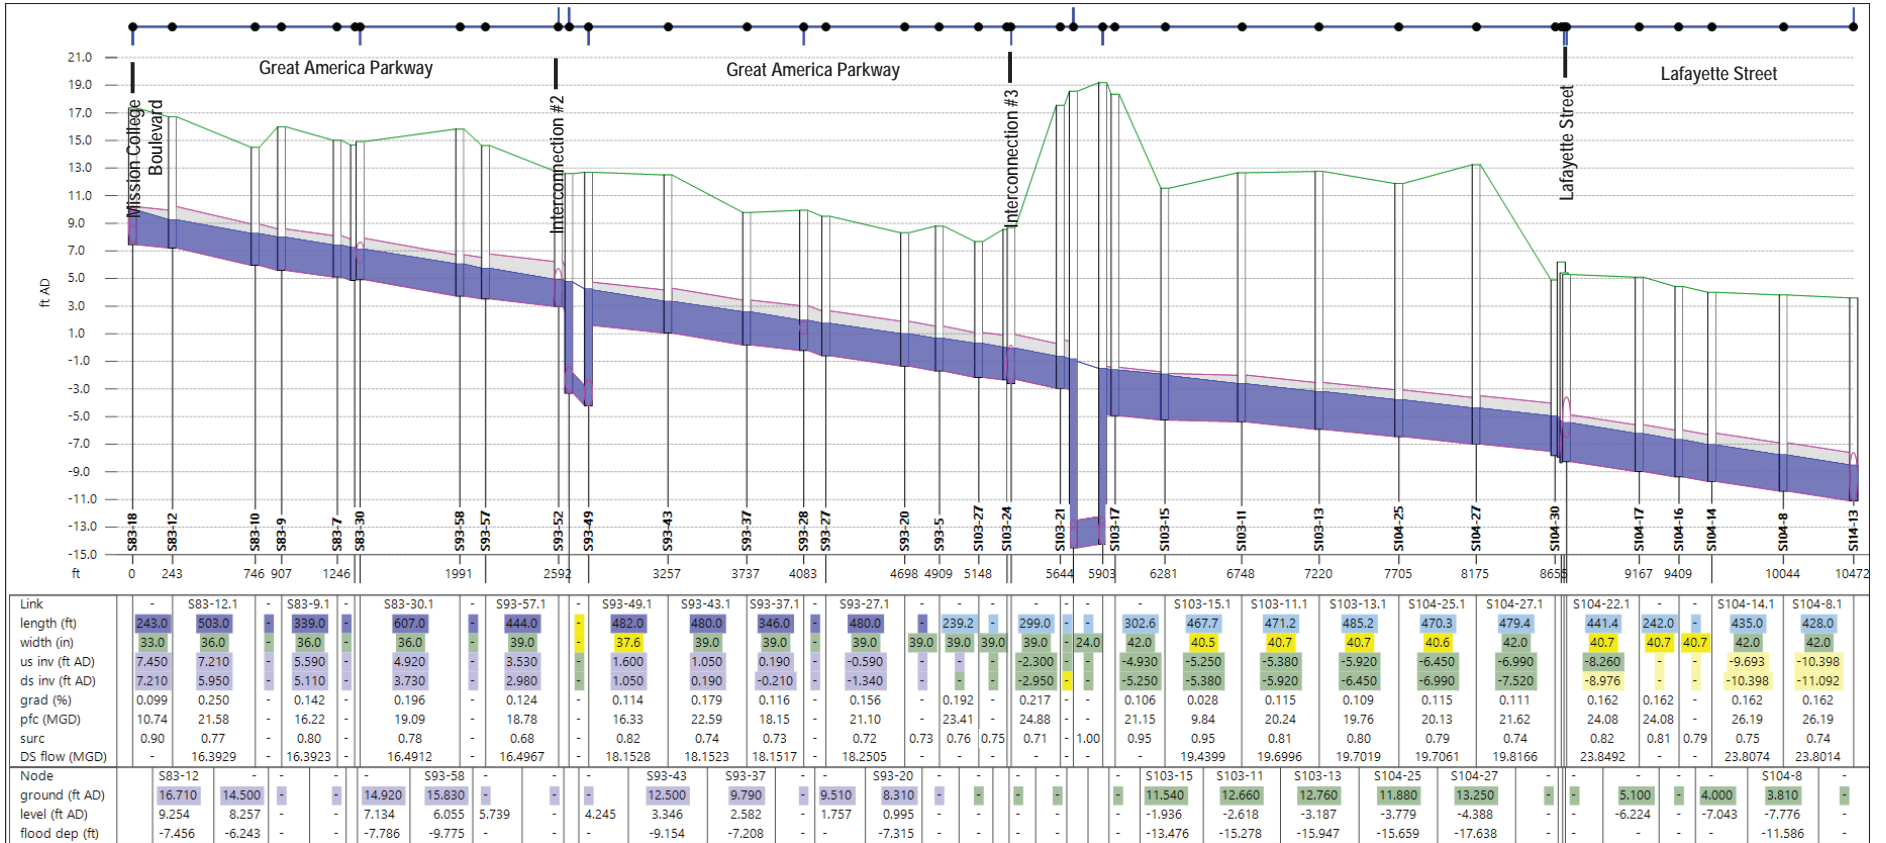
Great America Parkway East Trunk Improvements Profile (Future 2035 PWWF assuming Alternative 4 is constructed)
